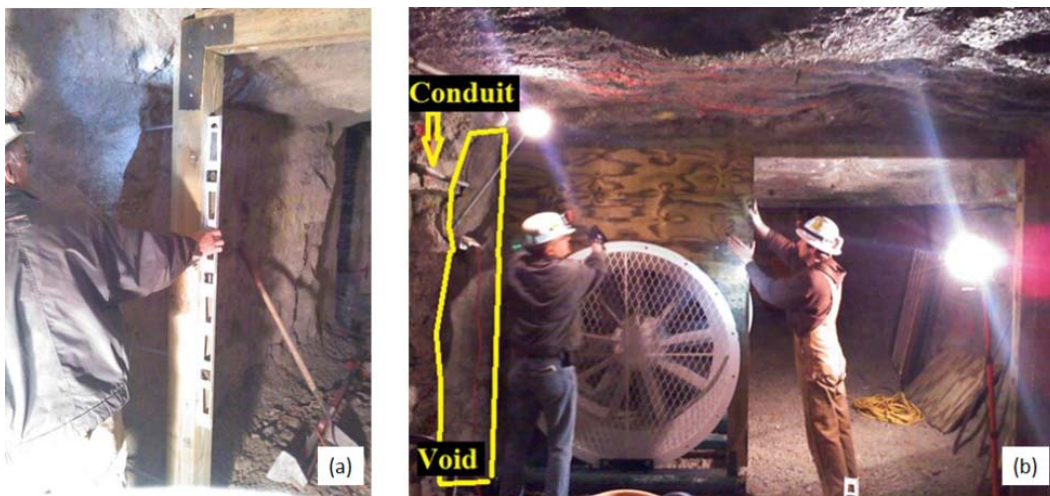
Bulkhead construction details: (a) Bulkhead frame, (b) Bulkhead before booster fan placement.
